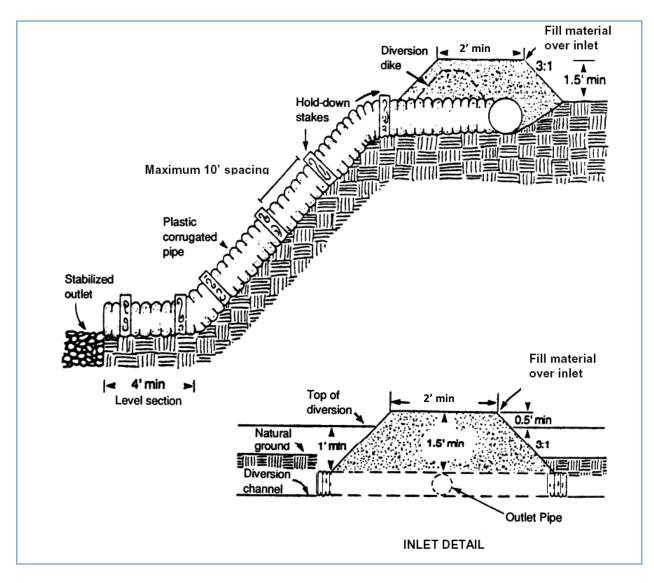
Slope drain pipe and inlet detail (Source: GA SWCC)
